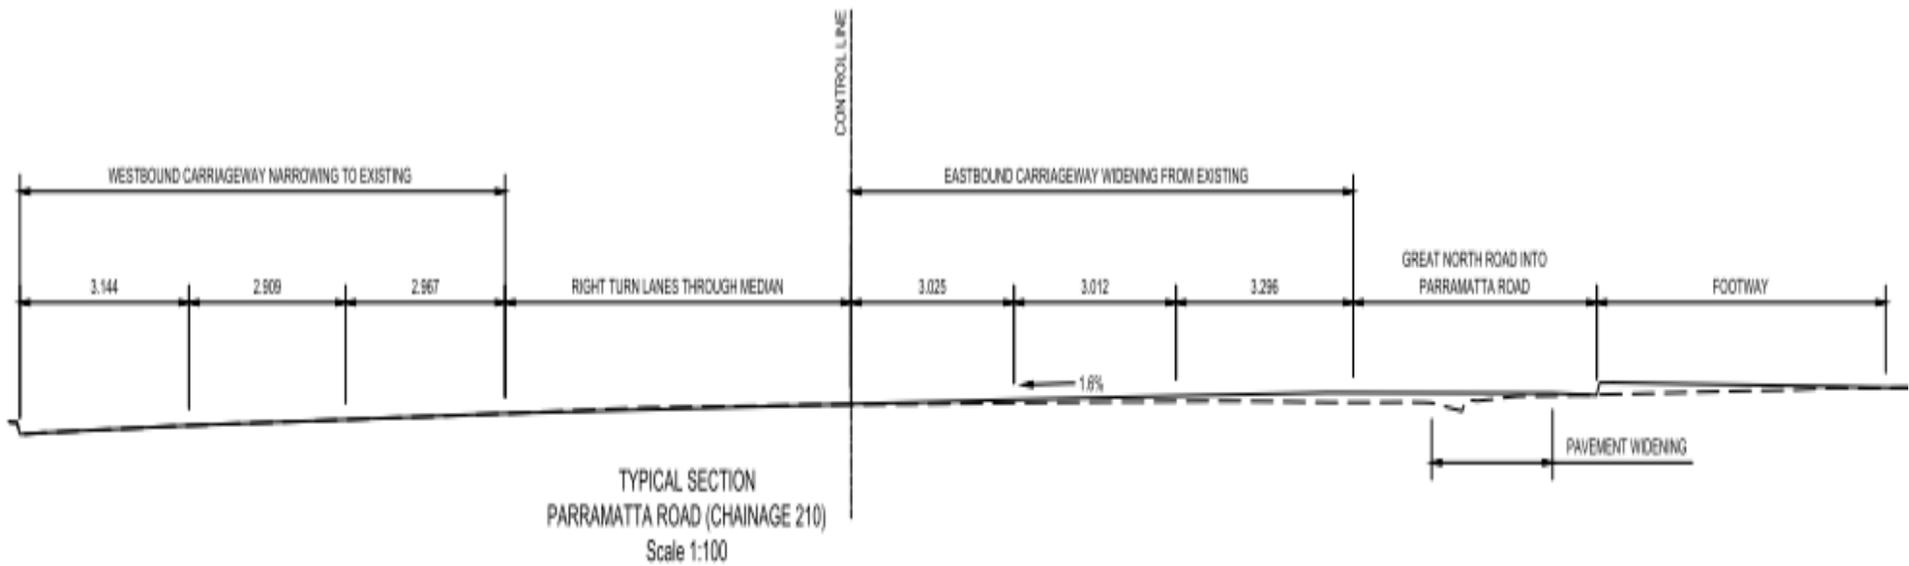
View of a typical cross section showing the proposed road design on Parramatta Road at the intersection with Great North Road (VBA 2016)
